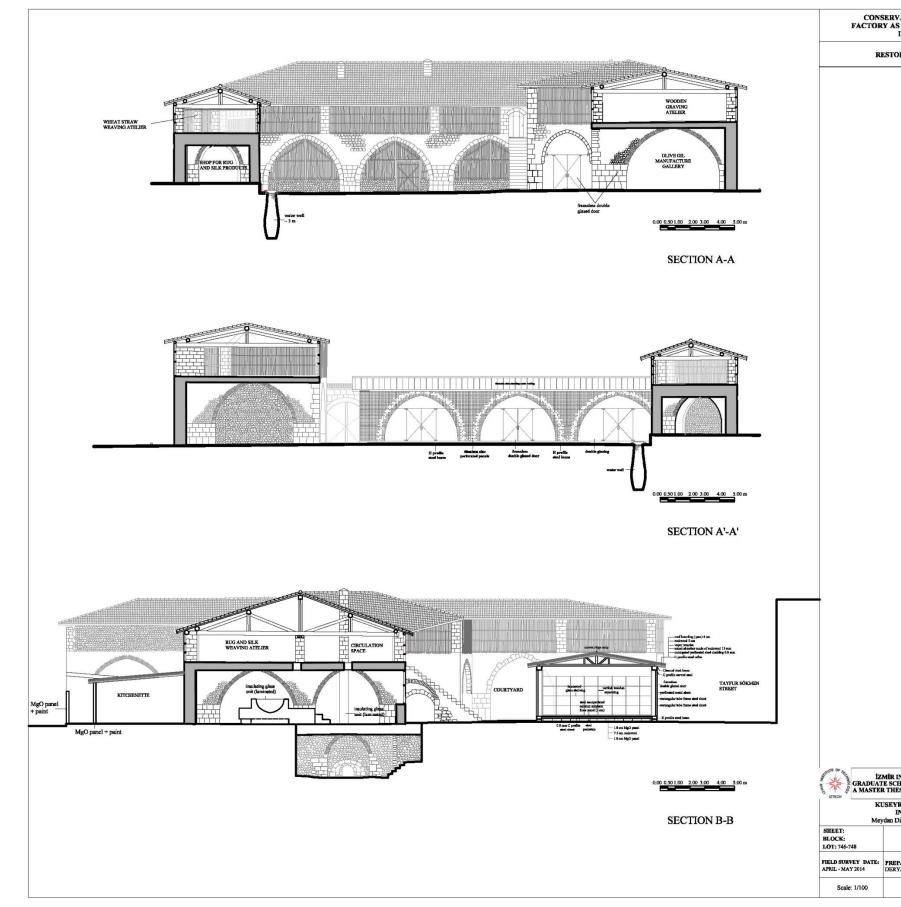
Restoration proposal – Section A-A, Section A'-A' and Section B-B
